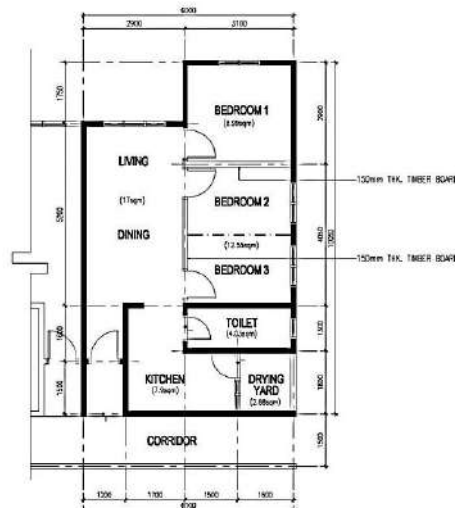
A typical floor plan and floor area of PPR House occupied by asnafs (18-storey flat)
